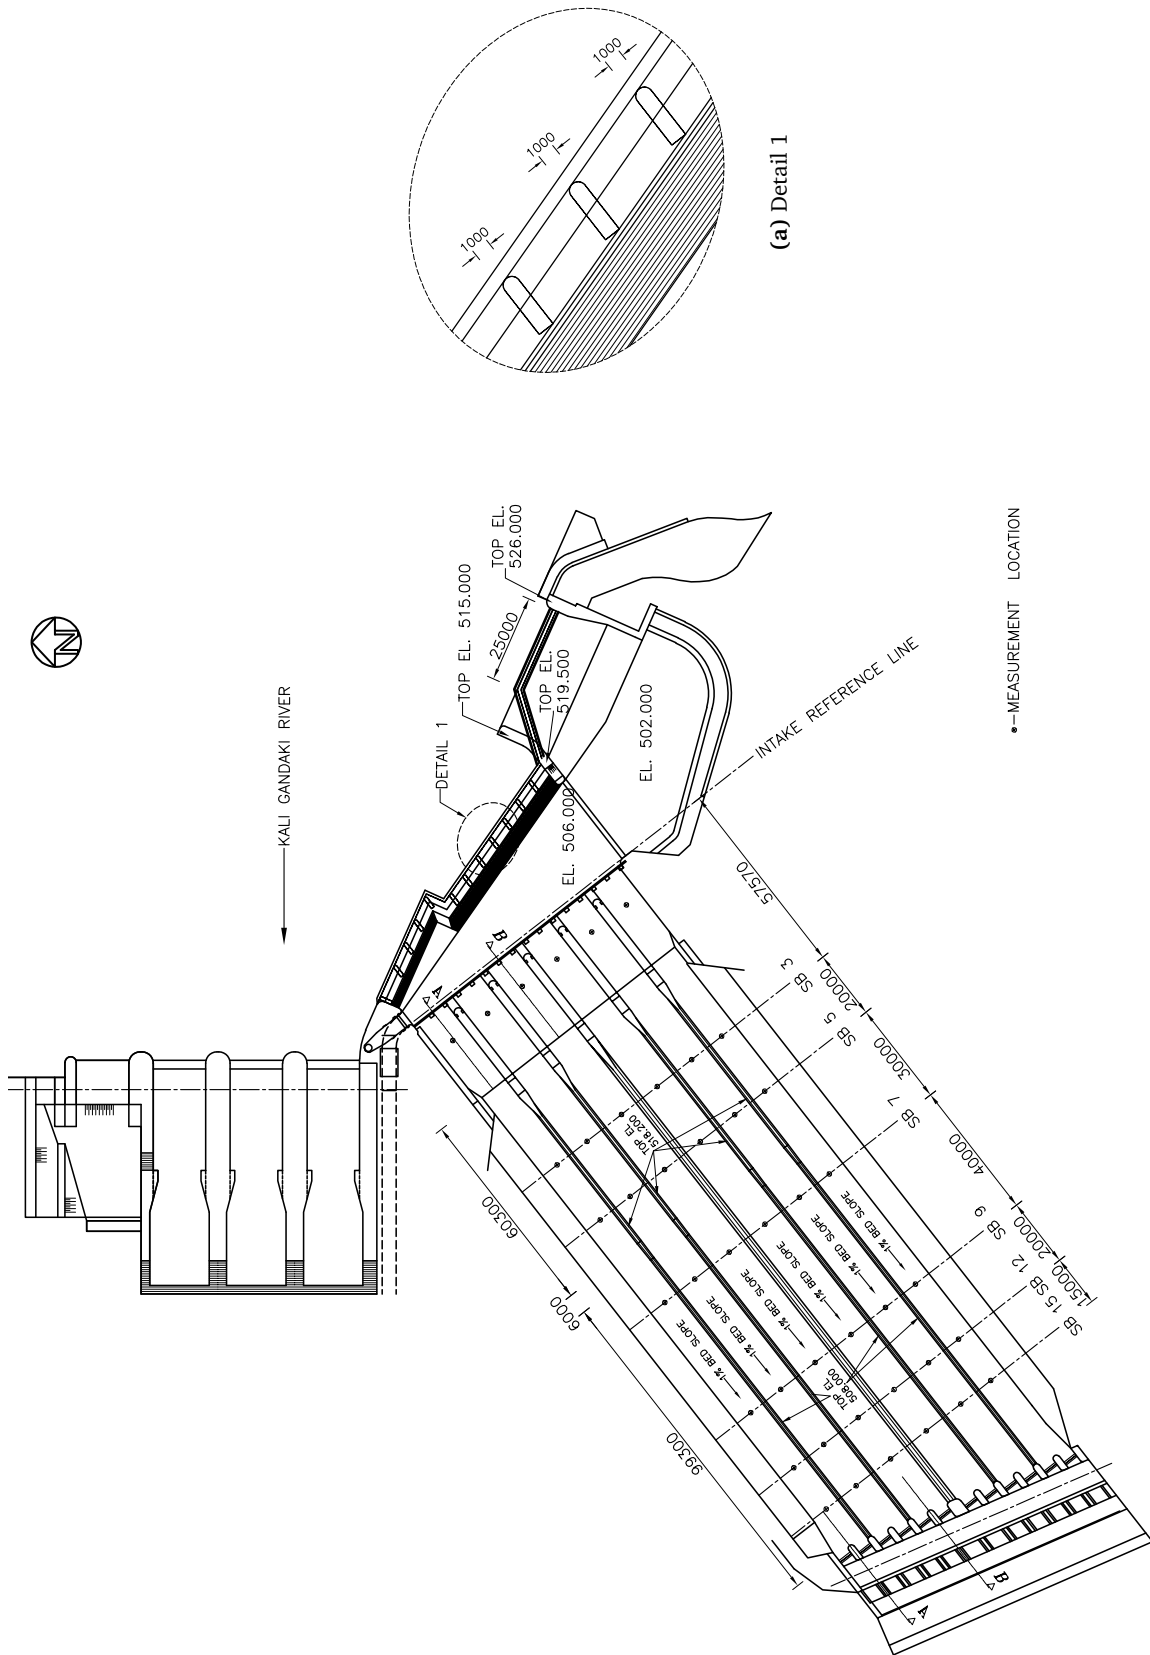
Plan view of the recommended modifications by Hydro Lab with measurement points and sections.
